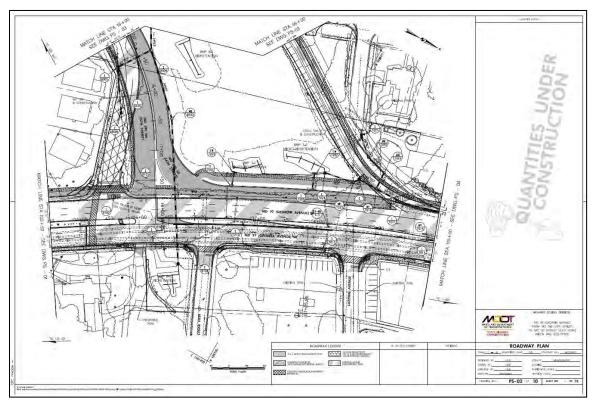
Plan View – Georgia Avenue at 16<sup>th</sup> Street
